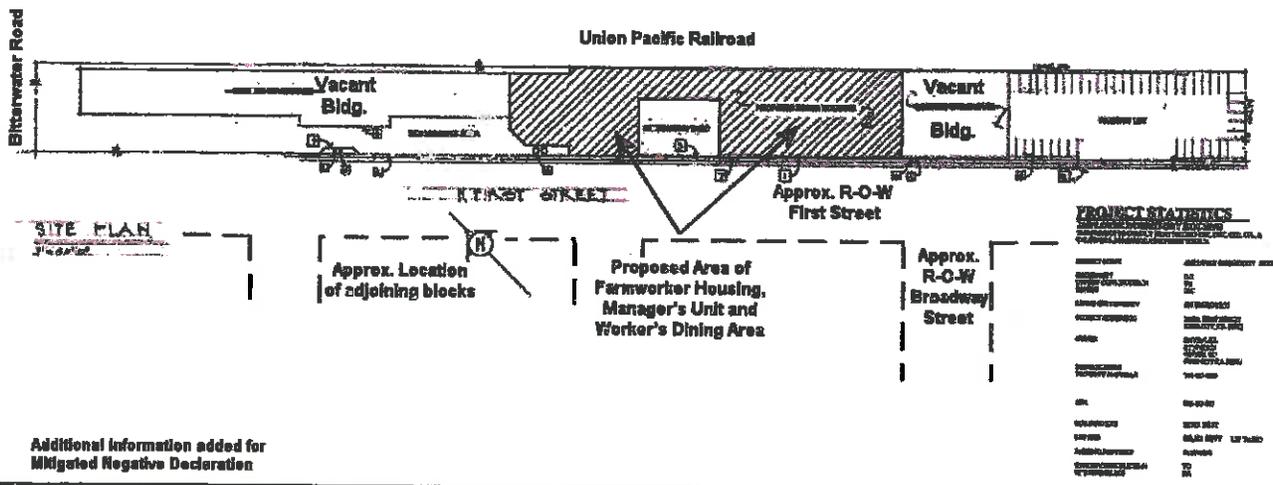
Initial Plot Plan of Farmworker Housing with added information, 218 N. First Street
